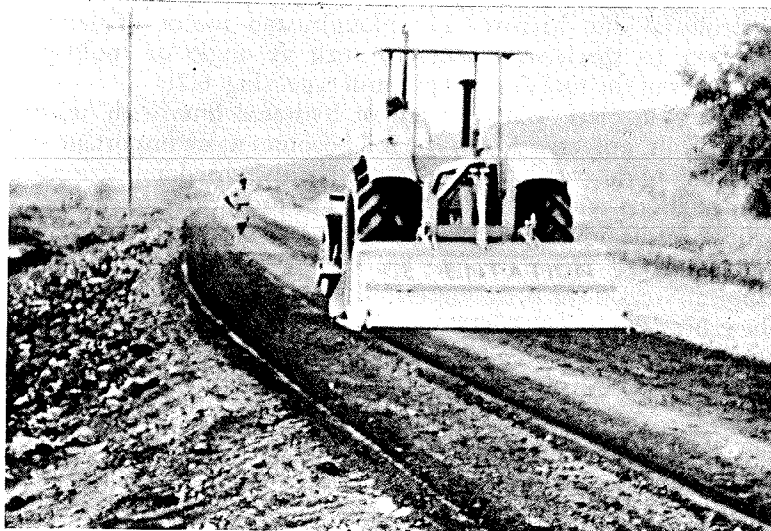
Mixing cement-stabilised road base with a multi-pass mixing machine. Kenya.
